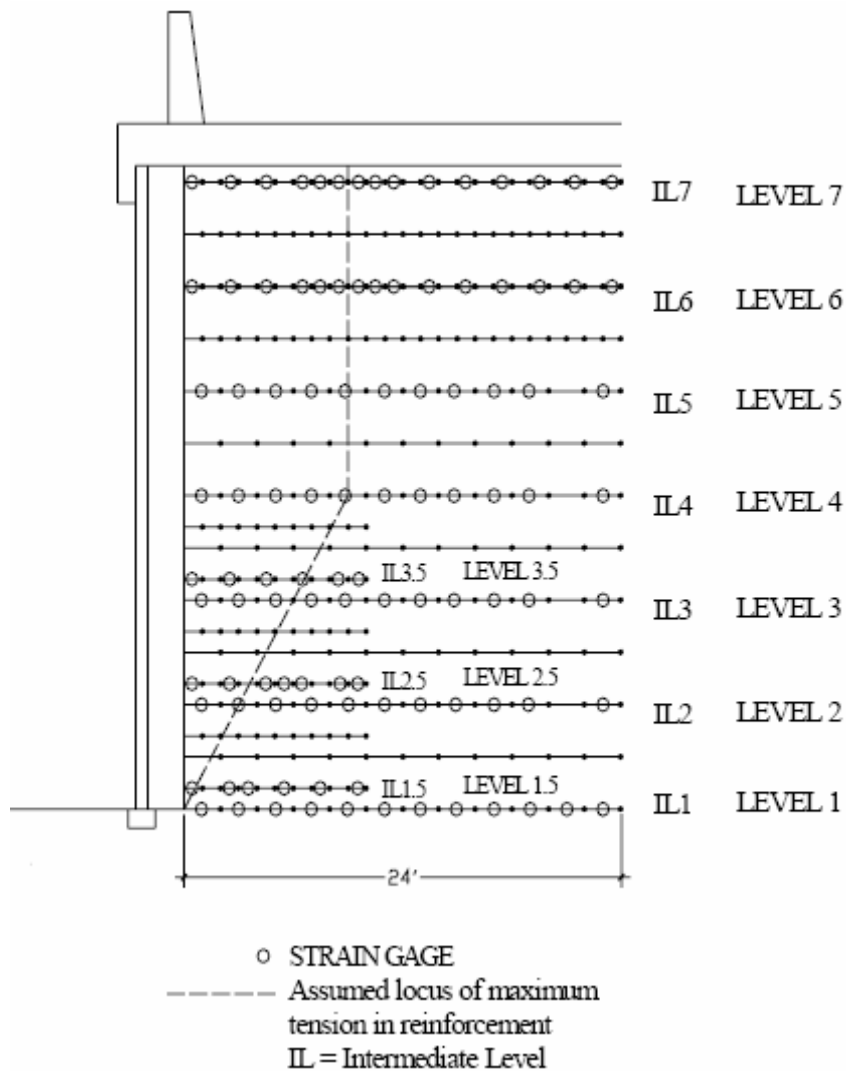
Elevation View of Wall Section with Instrumented Primary and Intermediate Reinforcement (Bay et al., 2003)
